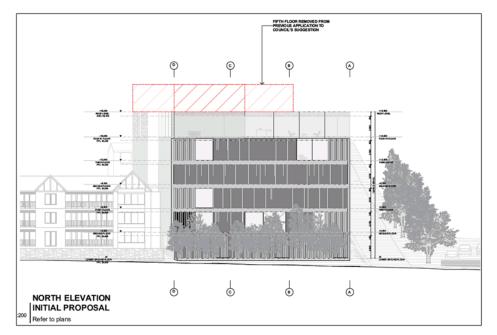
Proposed elevation along Sandy Bay Road (source: Room 11 Architects)
